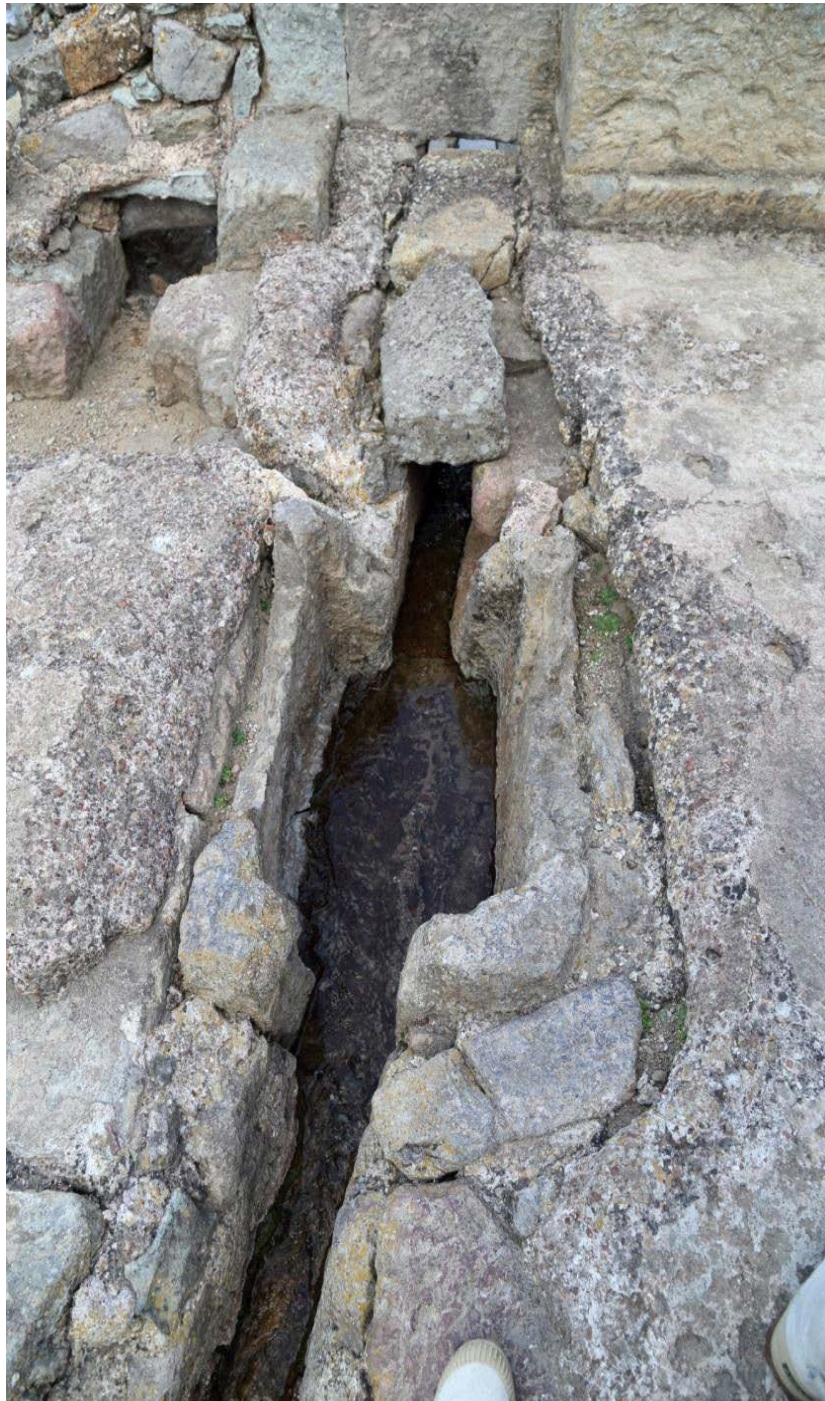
Canal built into the floor (photo by Unicity S.p.A.).
